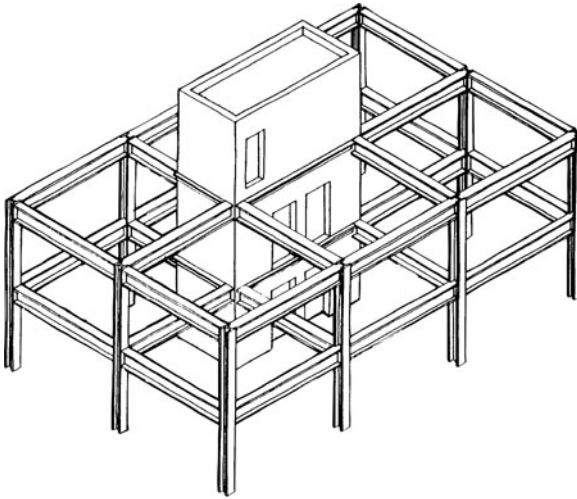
Drawing of steel frame with interior concrete shear-walls.
